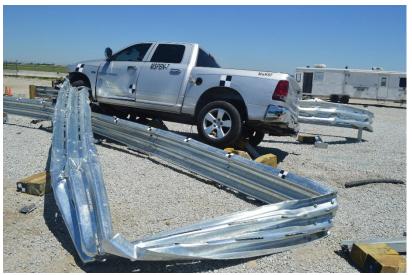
Damage to Rail at Post Nos. B5 through B8, Test No. MSPBN-7
